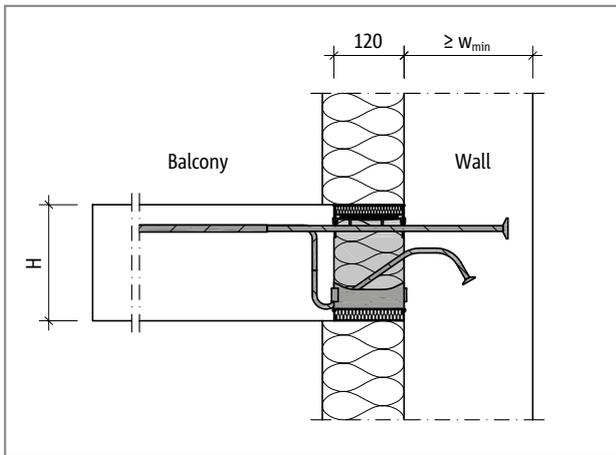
Schöck Isokorb® XT type K-U: Wall connection upwards with external insulation
